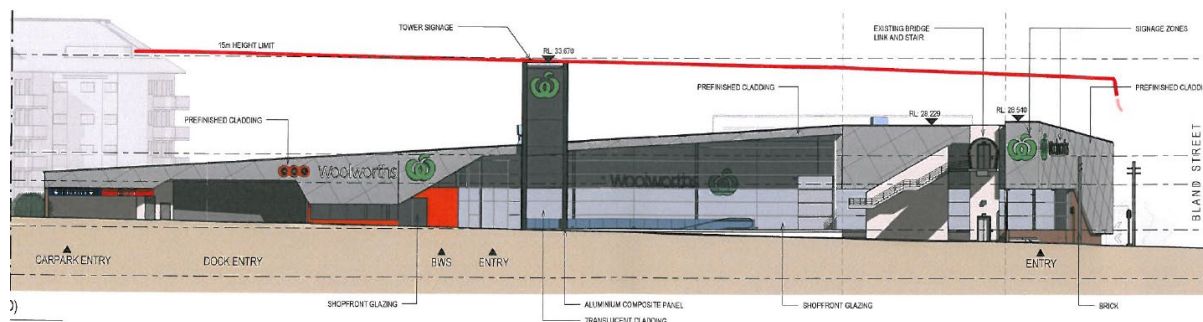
Approved Parramatta Road elevation of DA No. 10.2014.7.
